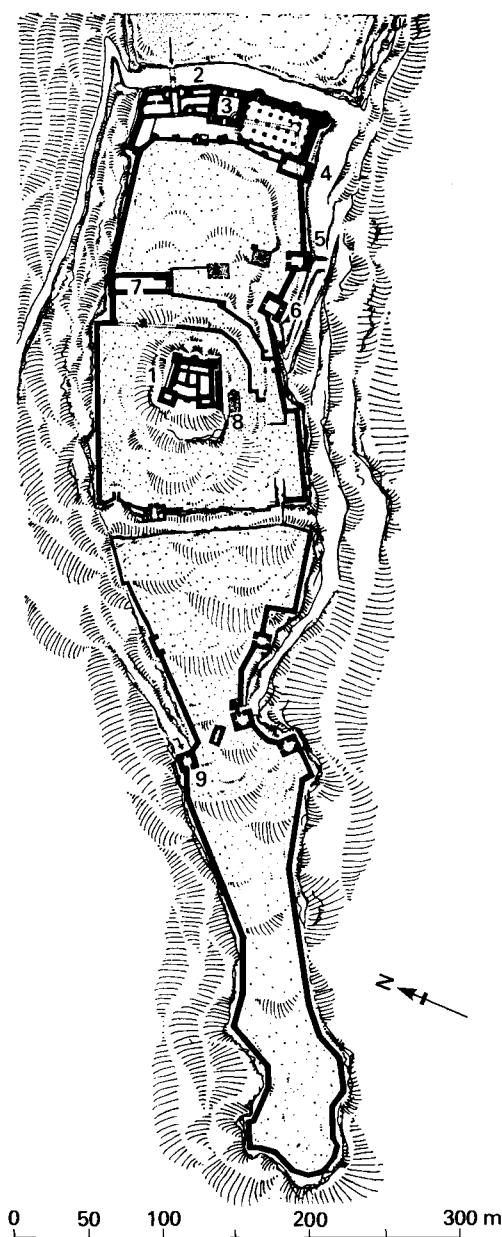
Saone: plan. The narrow castle runs along the summit of the ridge.
